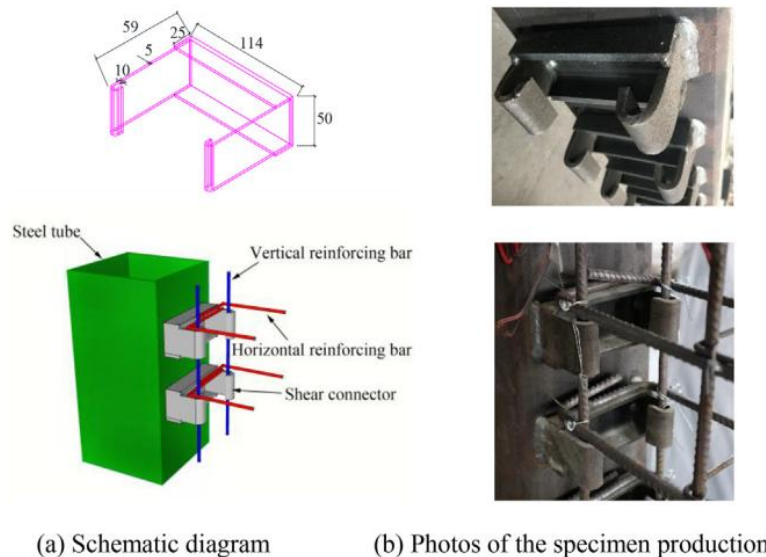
Steel shear connectors used for wall specimens of Zhang et al. (2021).
